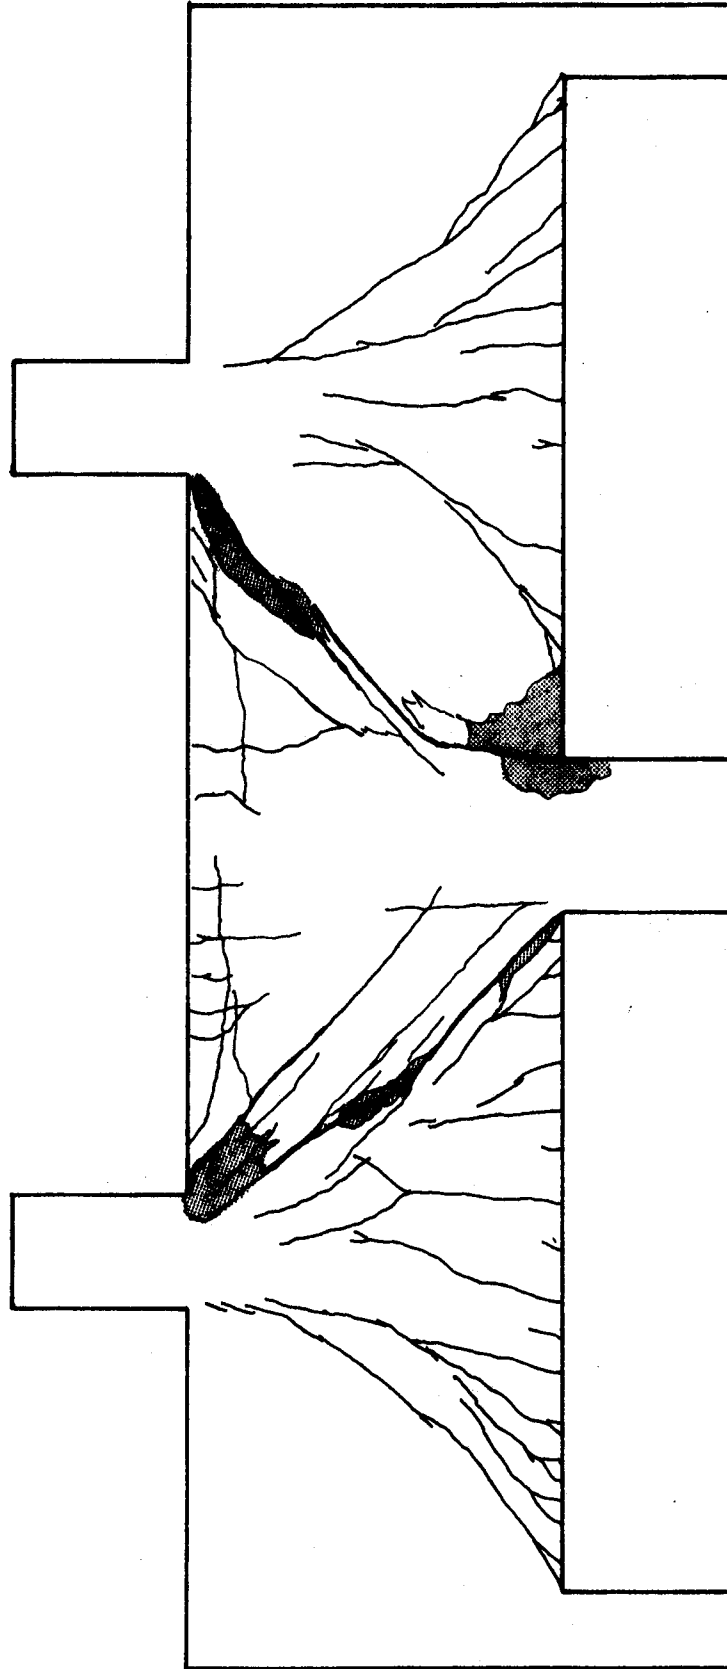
Beam 6/1.0 Crack Pattern - East Face (Reversed)
